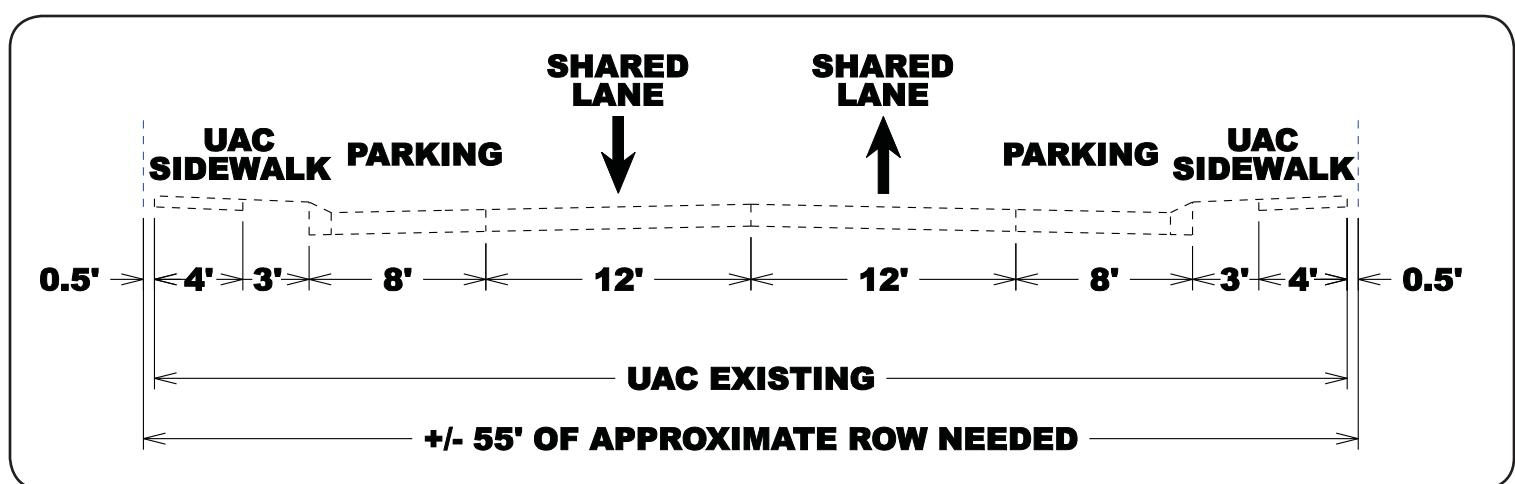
C. ASBURY ROAD PROPOSED CROSS SECTION FROM GREEN STREET TO UNIVERSITY AVENUE
